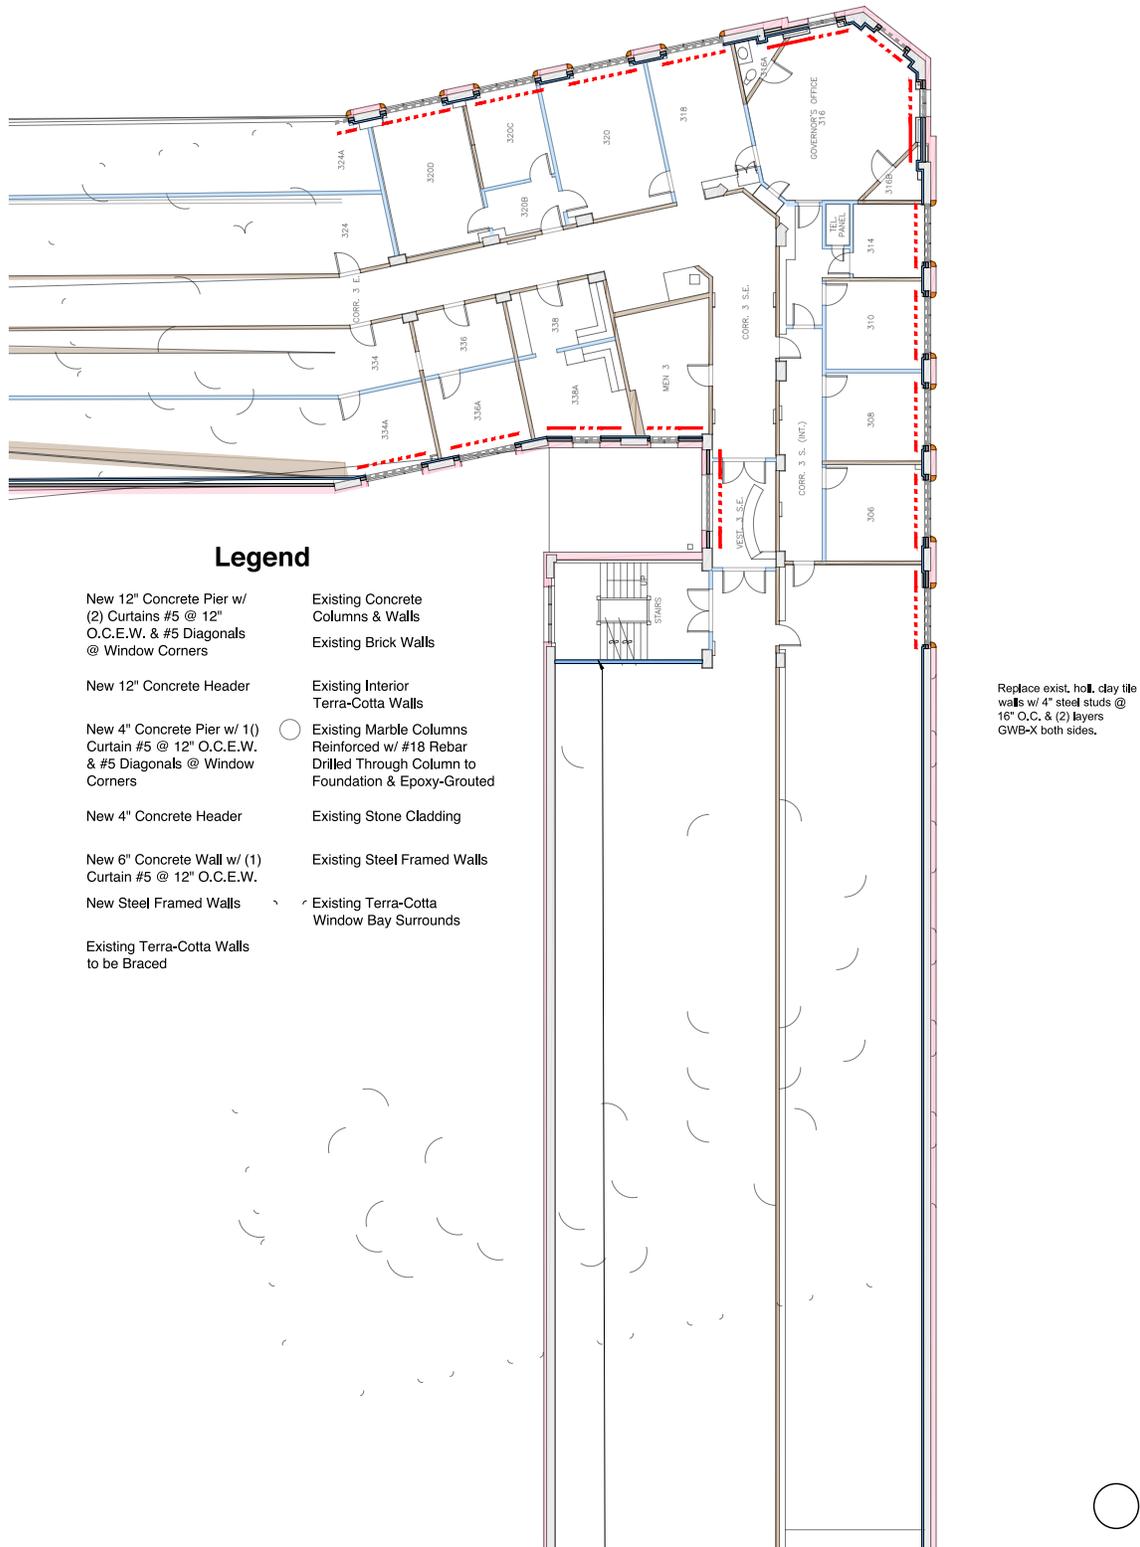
(5): Recom. HCT Wall Bracing/Replacement Locations-Floor Level 3
